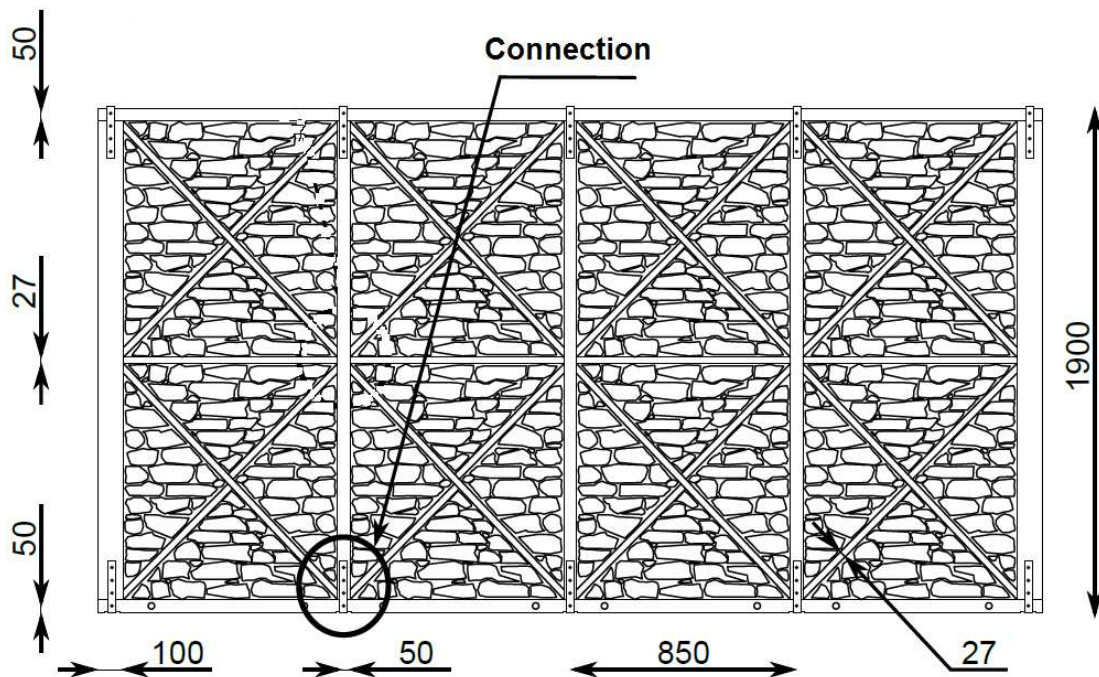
Dimensions of the timber shear wall with infilling.
